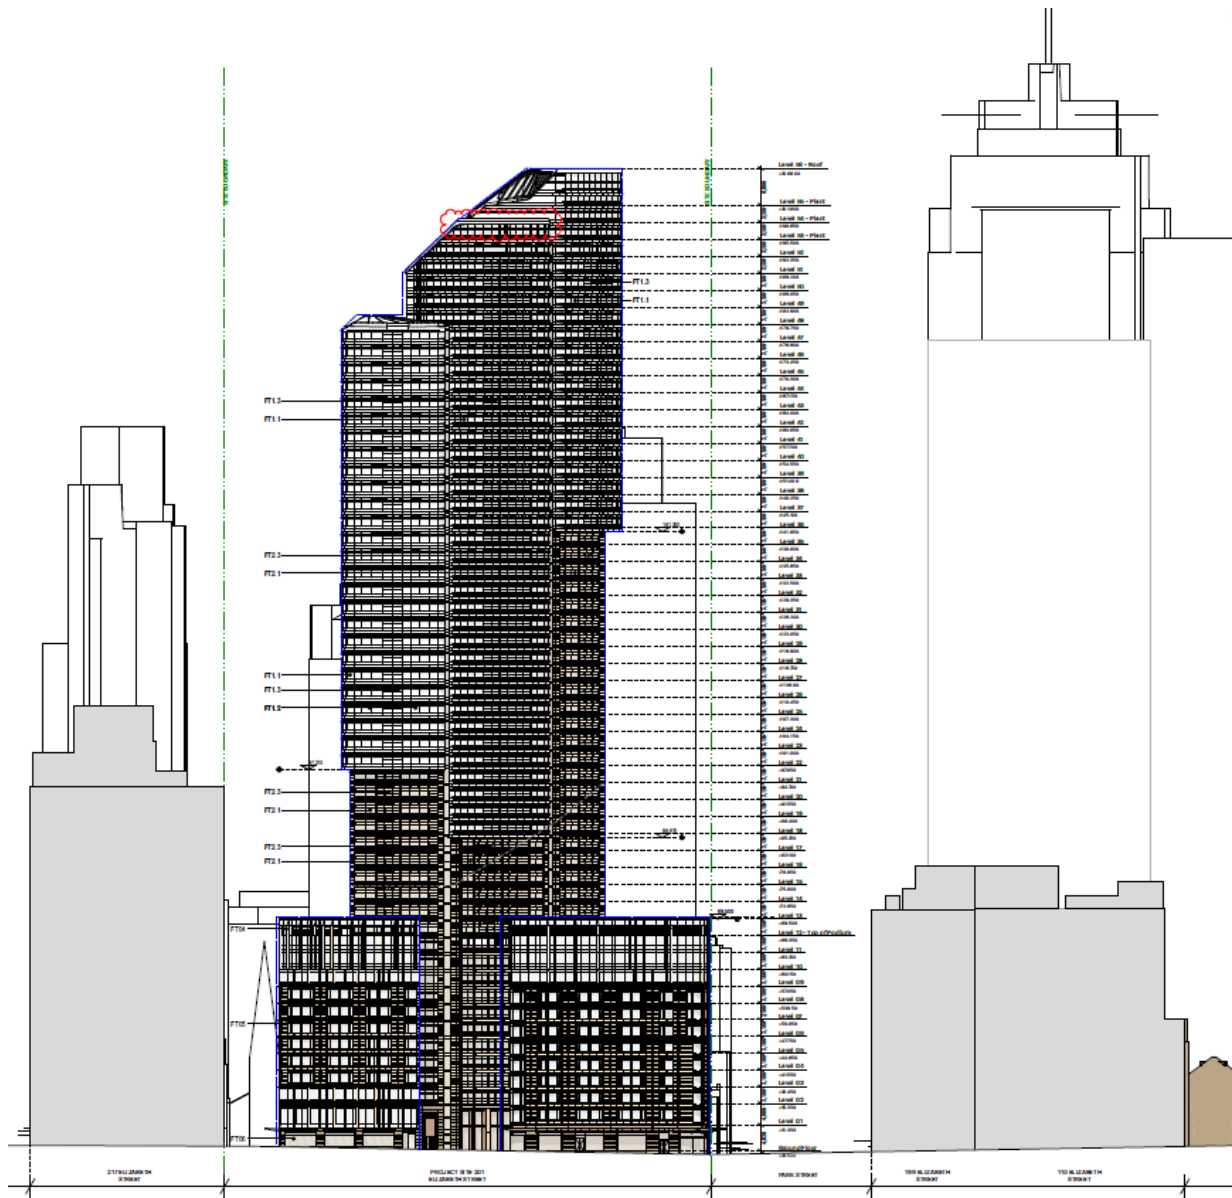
| Proposed east elevation (Source: Ethos Urban RtS amended architectural drawings)
